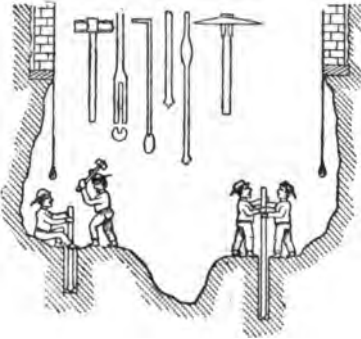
Sinking pit bottom, showing methods of drilling and tools used.
